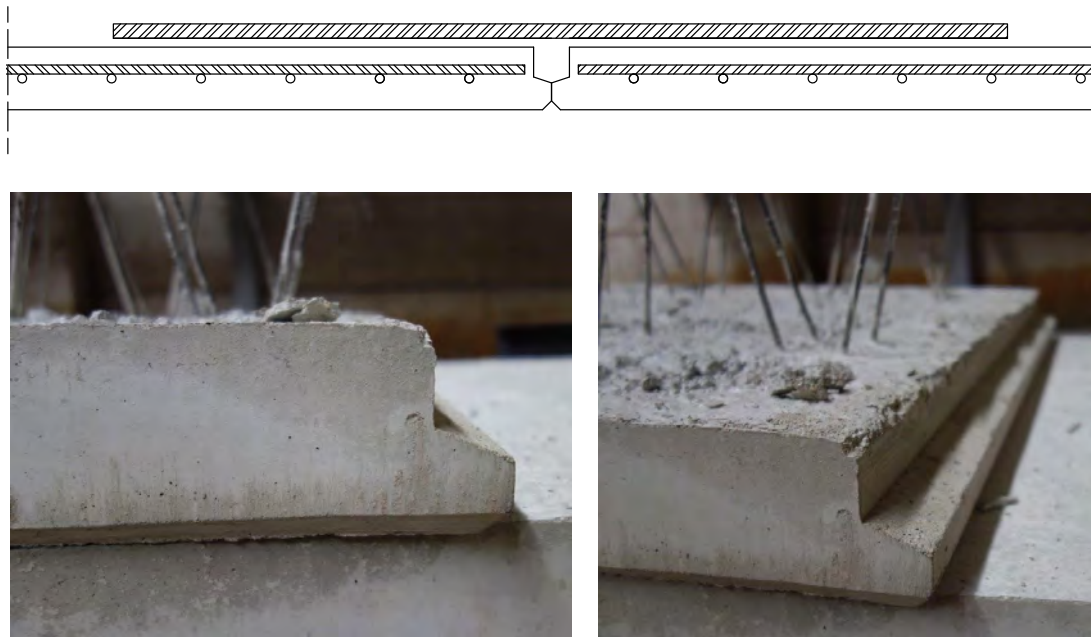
Redesigned joint without post-tensioning and produced prefabricated elements with the new joint design
